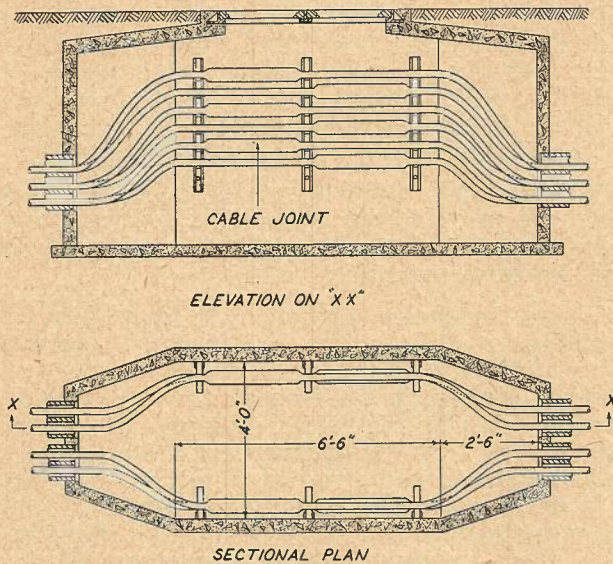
Suggested Manhole for 12 to 24 Ducts.
